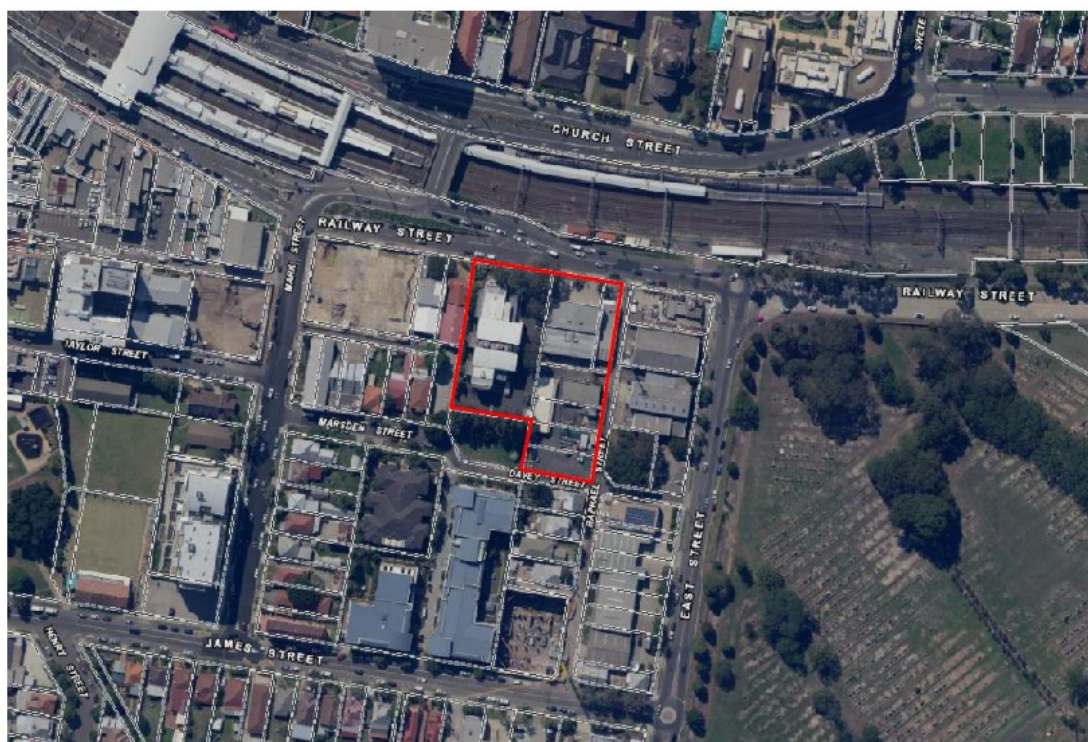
Site location plan, boundaries of subject site indicated in red.
